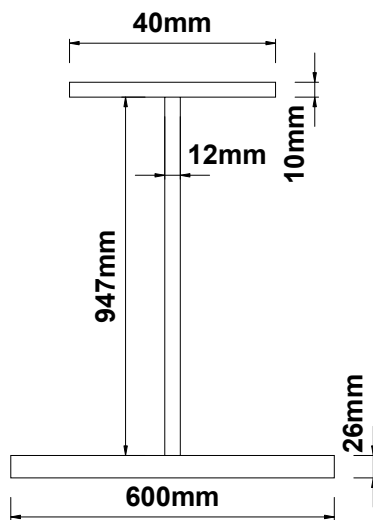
Cross-section of the steel beam at mid-span; material S355
